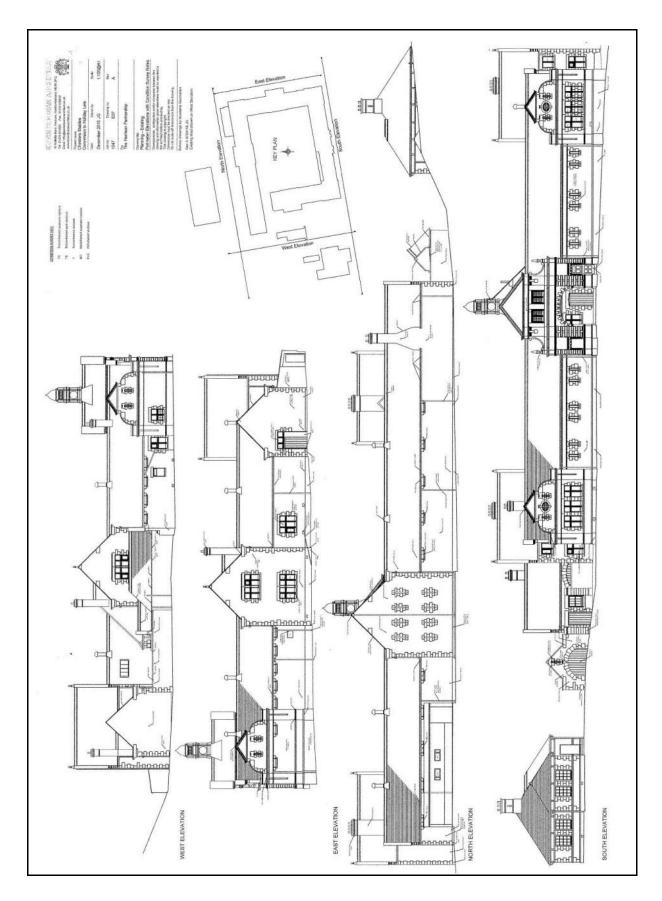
Chesters Stables. External elevations (Doonan Architects Drawing E07).
